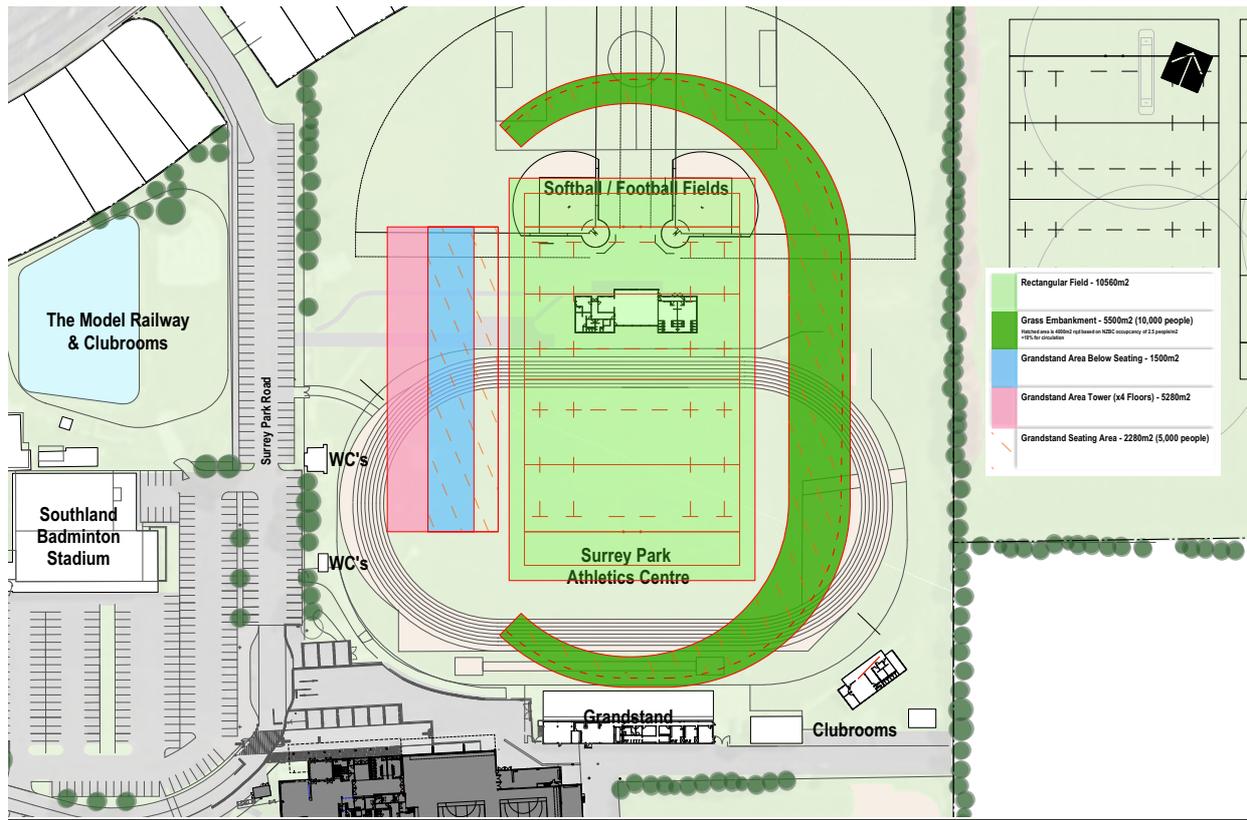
Option 3 Premier Rectangular Stadium Overlay Plan
